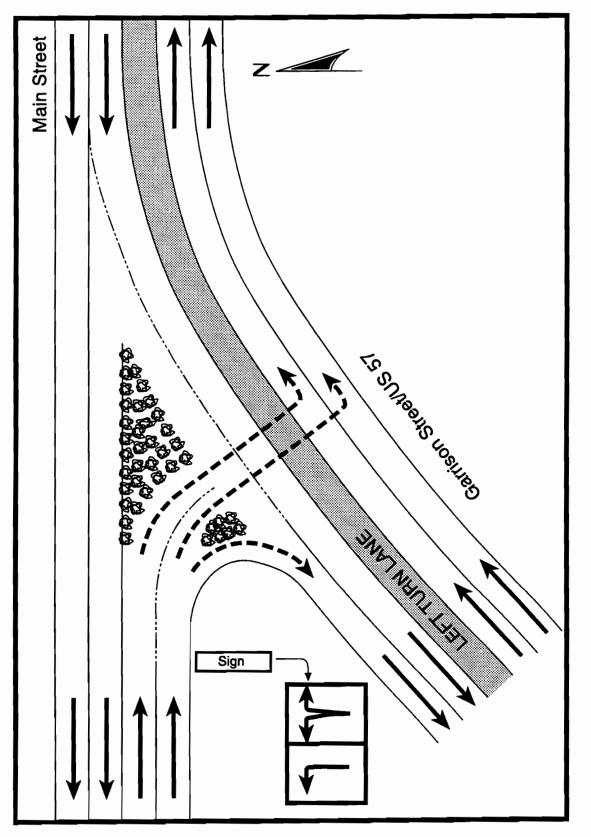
Recommended Signs for US57 and Main Street Intersection
